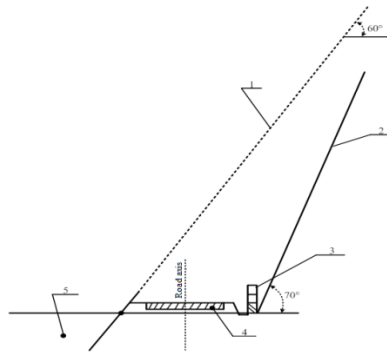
A cross-section of a mountain road. 1 – slope line; 2 – slope profile; 3 – a protective wall of concrete blocks or solid concrete; 4 – subgrade on bedrock; 5 – deposits of soft massive rock (the avalanche in the development of dredging).
